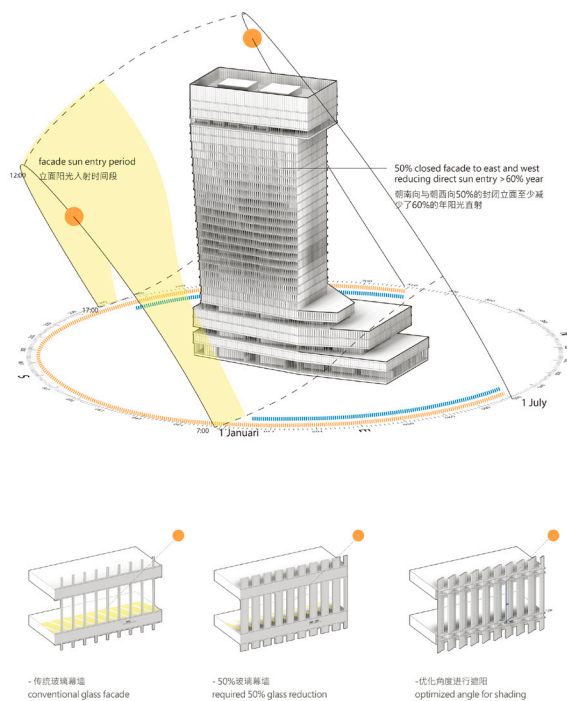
Façade folding strategy & perspective view of Shanghai HQ plinth (Mecanoo)
